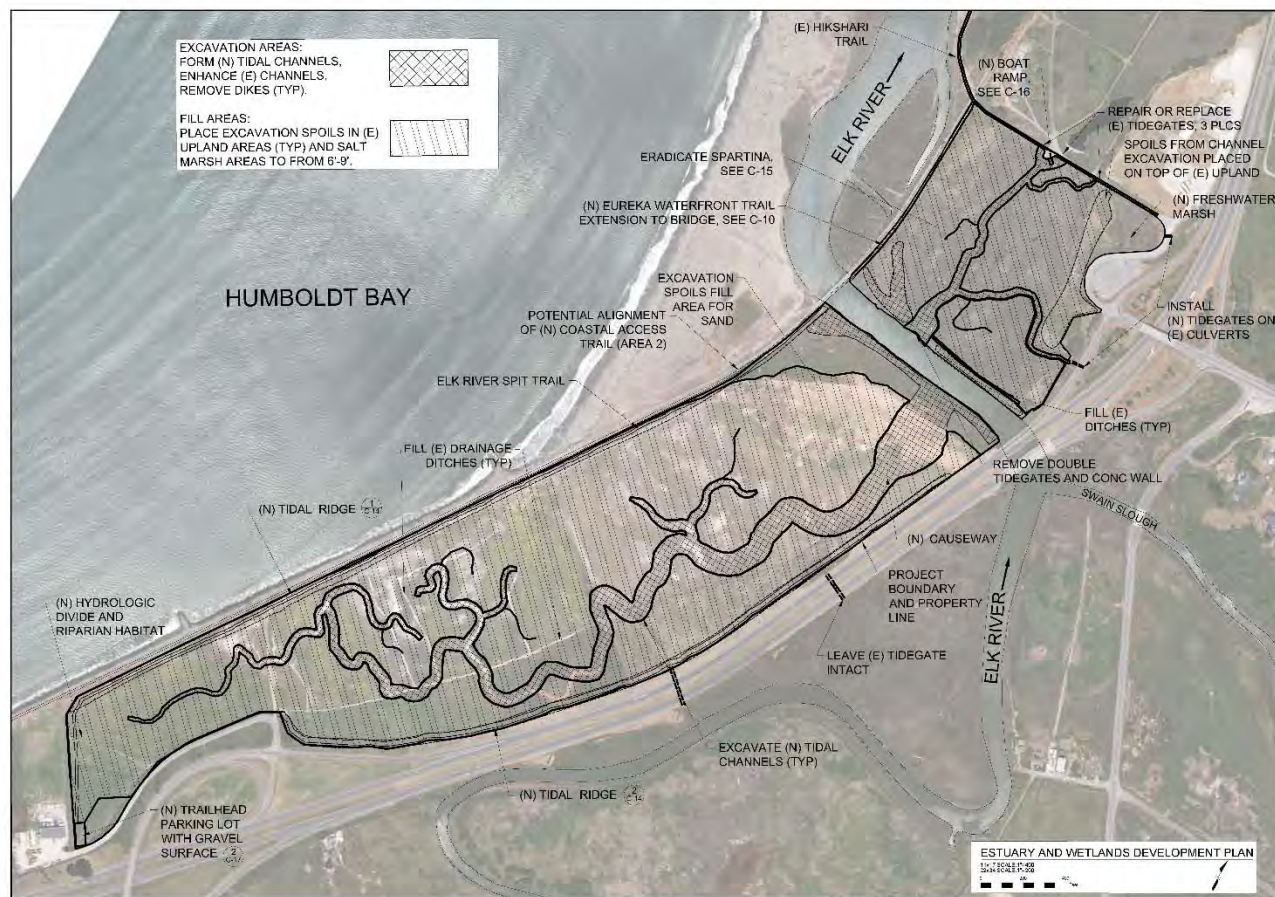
Overview of the estuary and wetland development plan, showing new tidal channels as well as locations of causeways, viewing platforms, trail extensions, and the non-motorized boat ramp.
